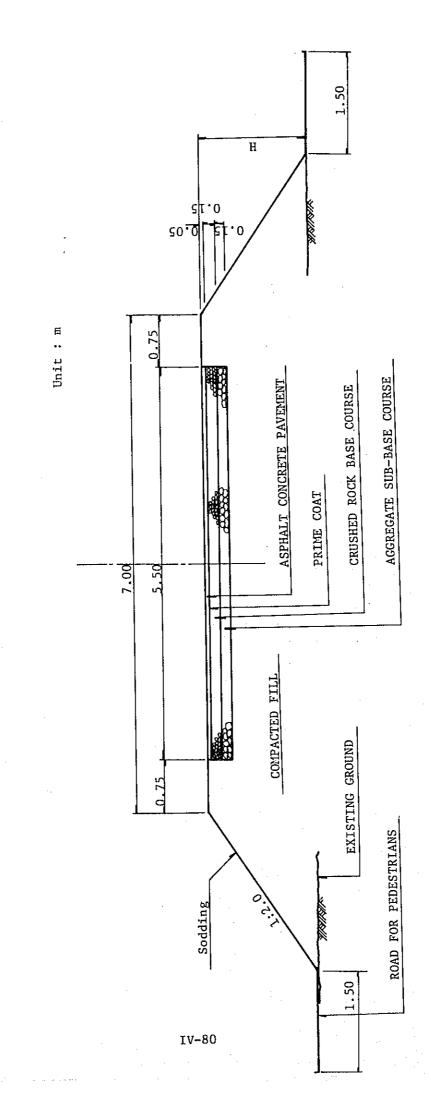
STANDARD CROSS-SECTION FOR ROAD RAISING
